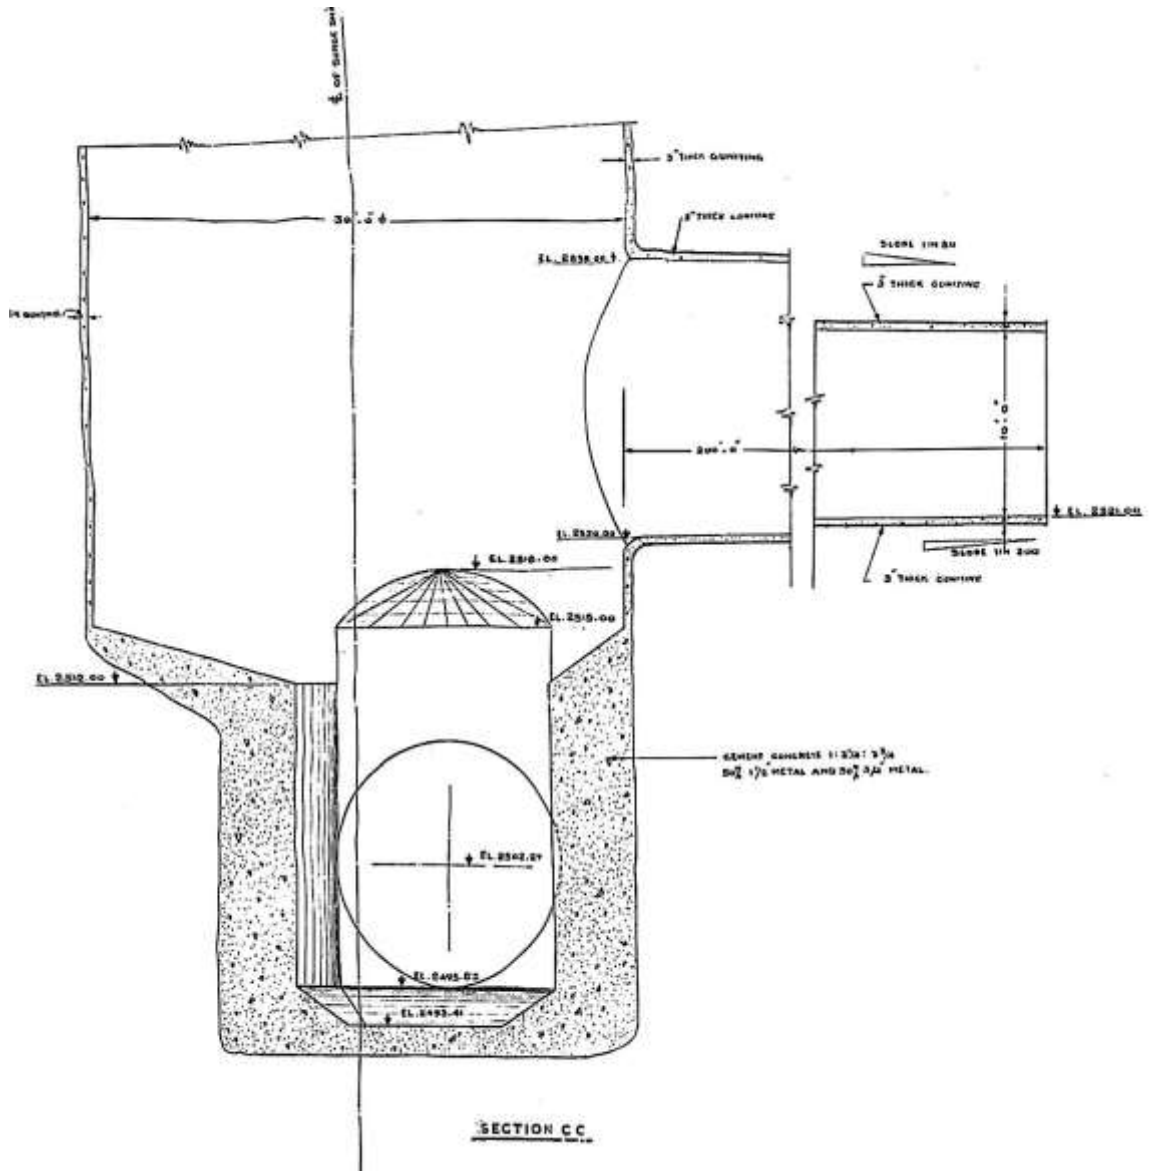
Cross Section of Submerged Gallery at Surge Shaft
